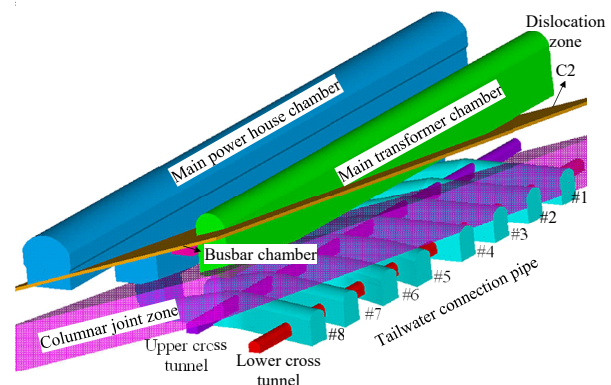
Layout of main underground chambers at the left bank of Baihetan Hydropower Station
